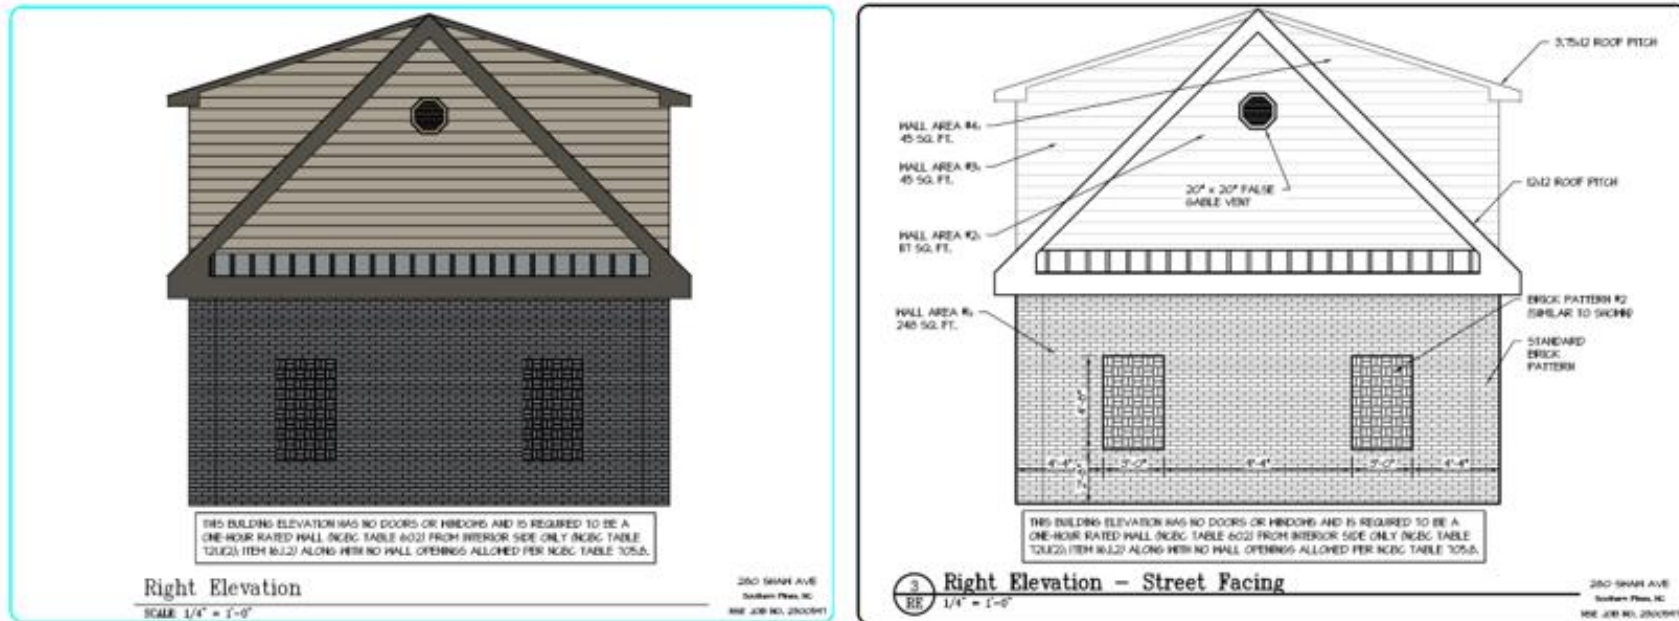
New renderings of proposed elevations based on recommendation of the Town Council on June 11, 2024. North elevation facing Shaw Avenue with herringbone pattern and false gable vent.
